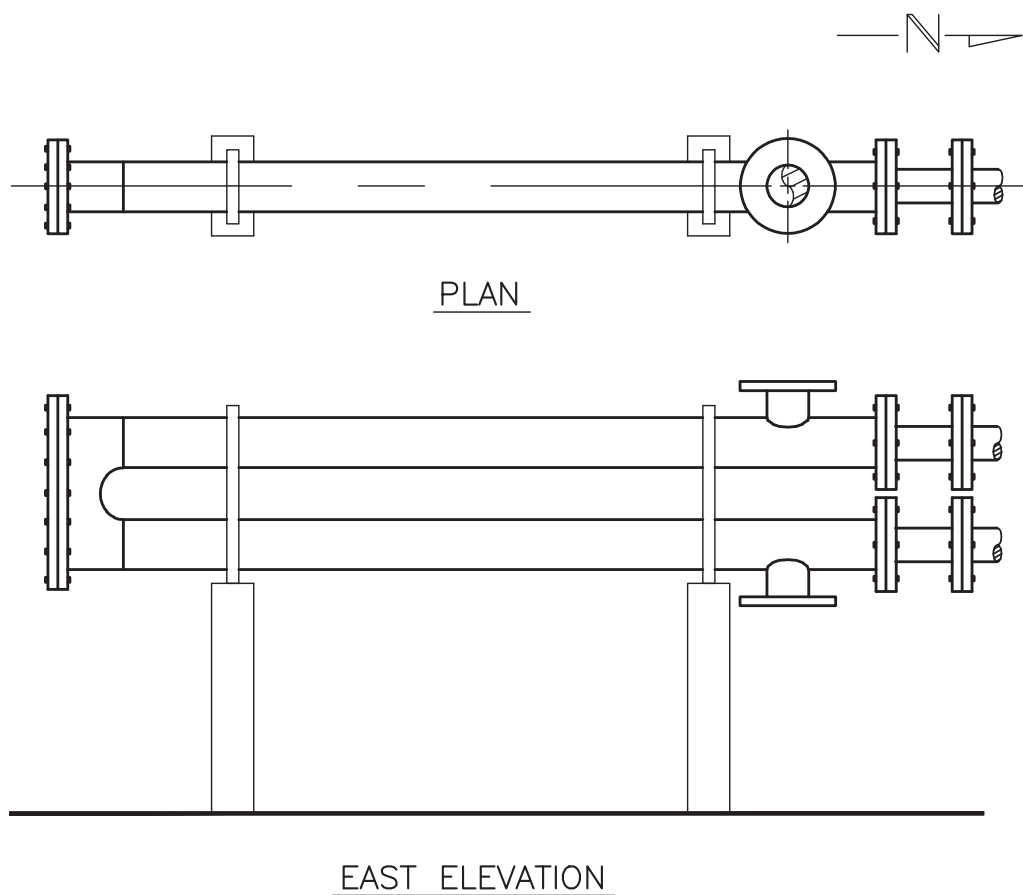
Double-pipe exchanger Plan and Elevation views.
